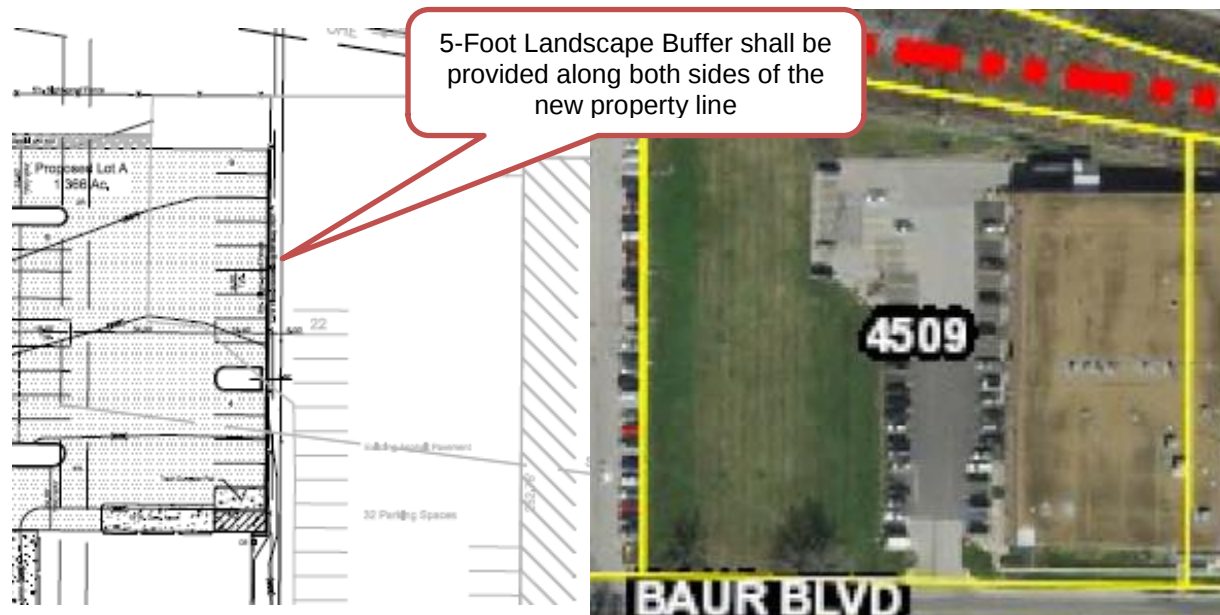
Close-up of the site development plan submitted April 24th, and of the aerial photo of the existing 4509 Baur Blvd of the concrete area to be removed.
